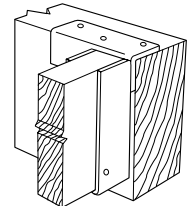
Ridge top flange sloped (Specify low or center flush). Low side shown
